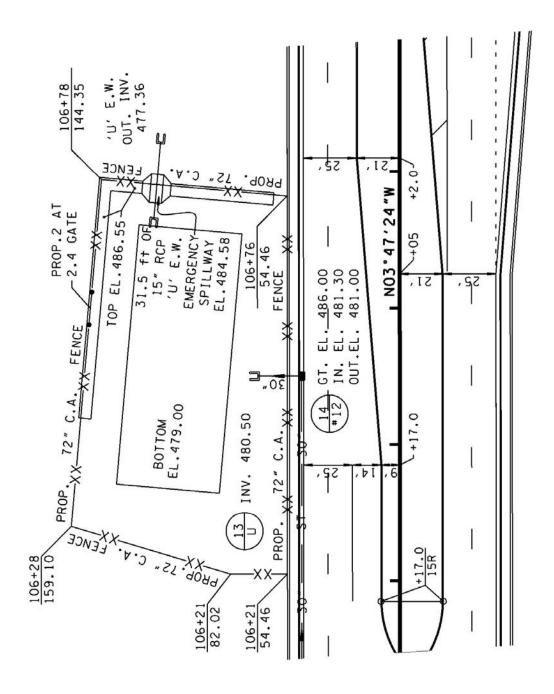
A-16. Portion of Proposed Layout Sheet (Detention System)
